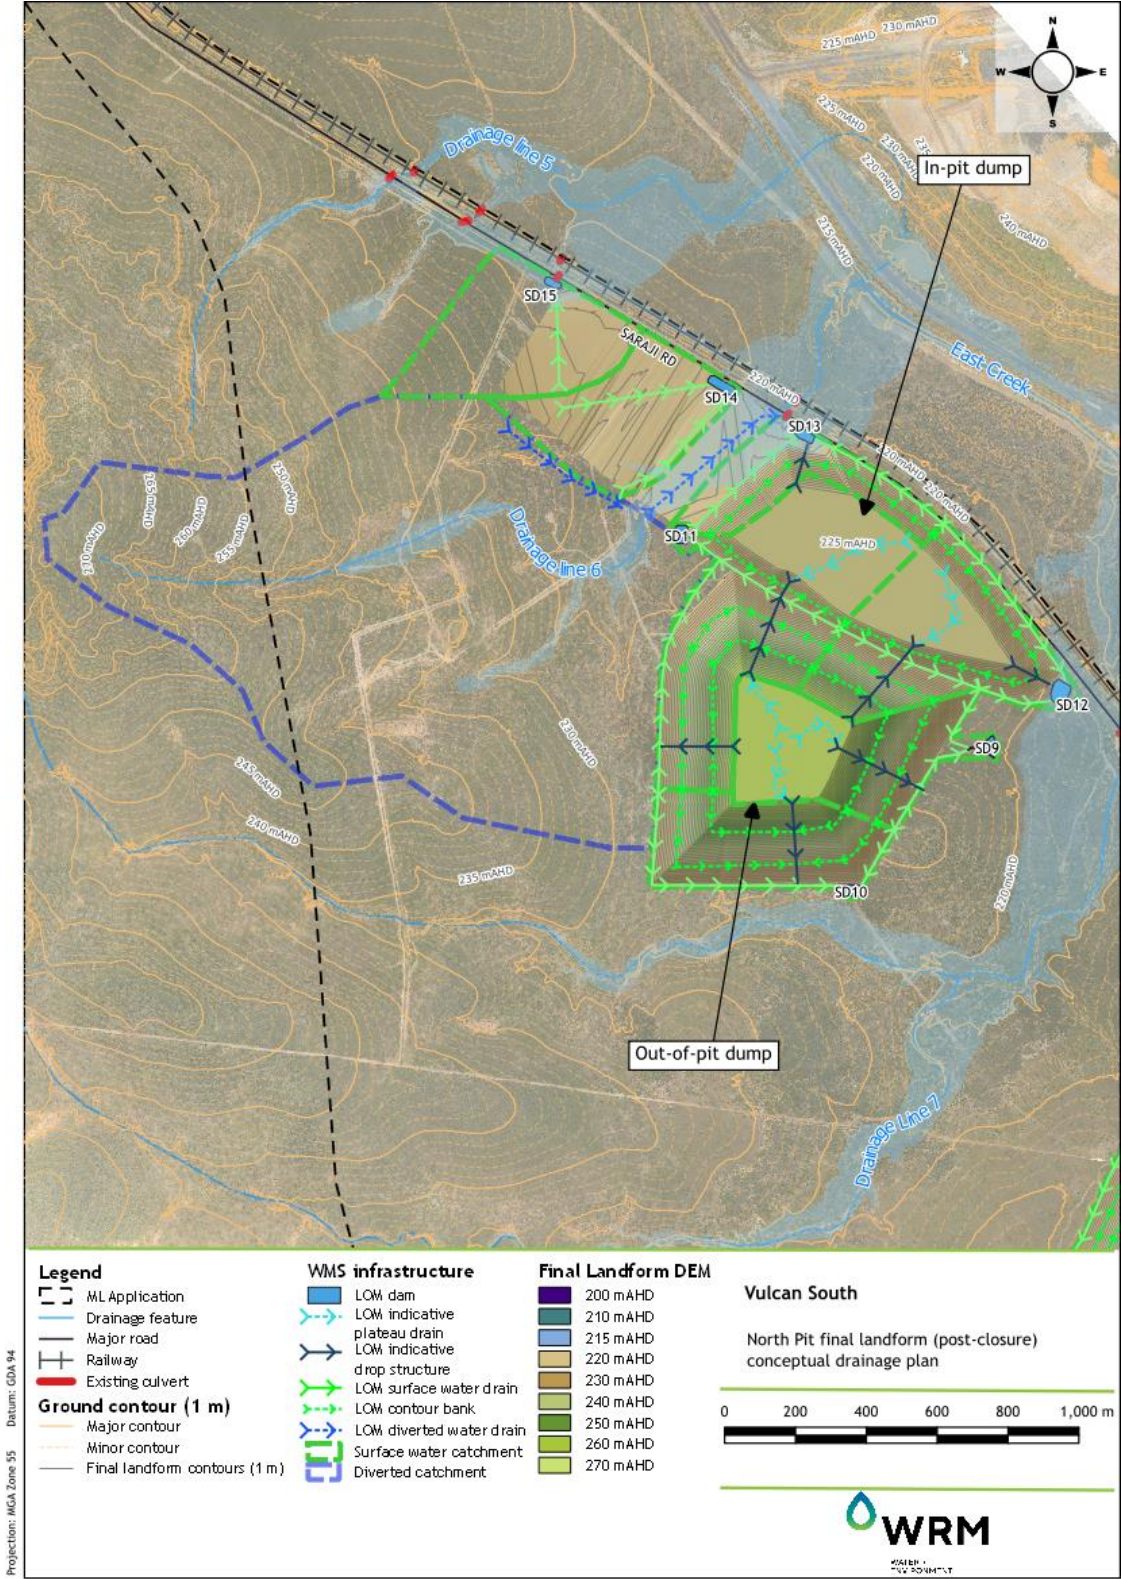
VS North final landform (post-closure) conceptual drainage plan
